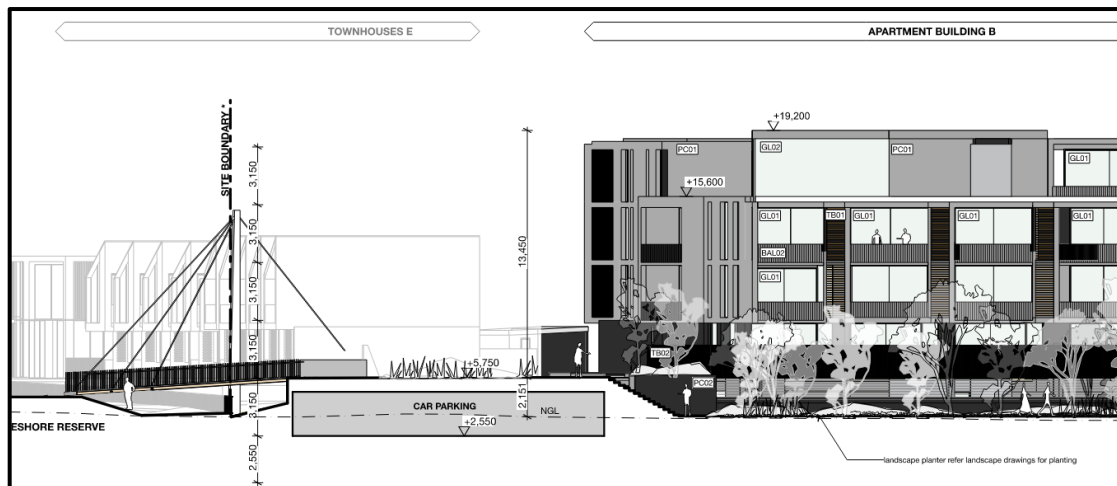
An elevation view of the proposed link bridges spanning across both private and public land to form a connection with the multi-use trail.
